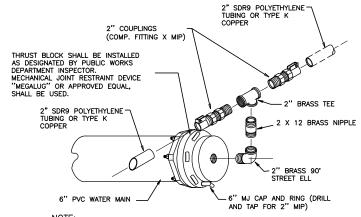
# DETAIL "A" TEST RISER ASSEMBLY CONNECTION
